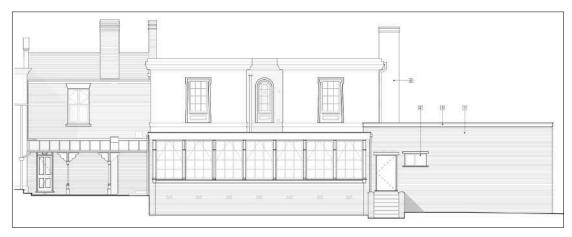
Proposed south elevation. Image courtesy of Michael Cruise Architects.
